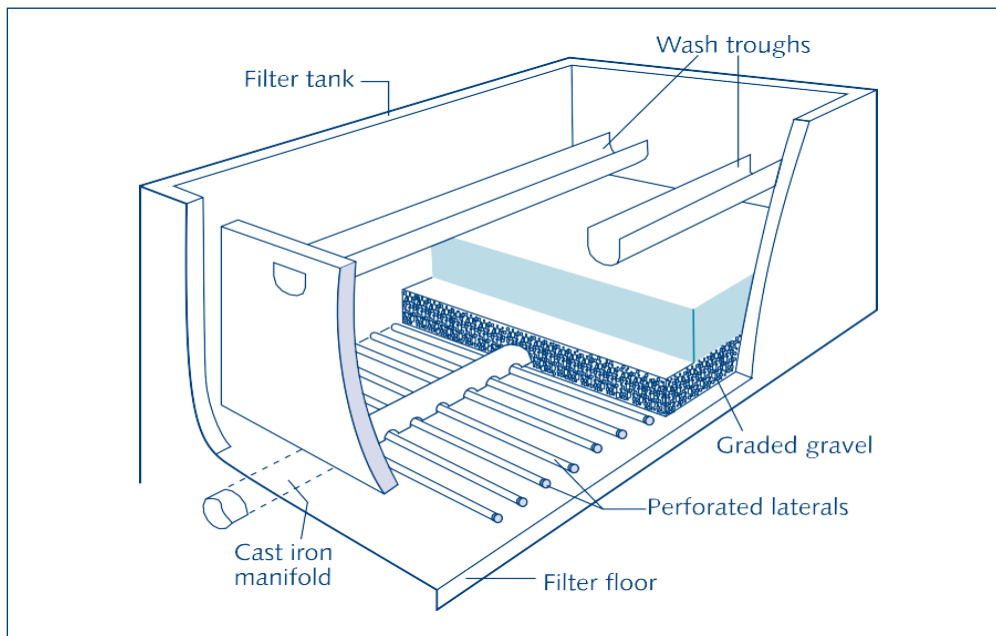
Layout of some elements of the treatment plant (Source: Vigneswaran and Sundaravadev, 2009).
